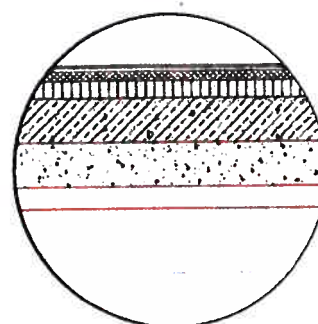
Detail A - STUDIED ROAD STRUCTURES / Detaliu A - STRUCTURI RUTIERE STUDIATE
